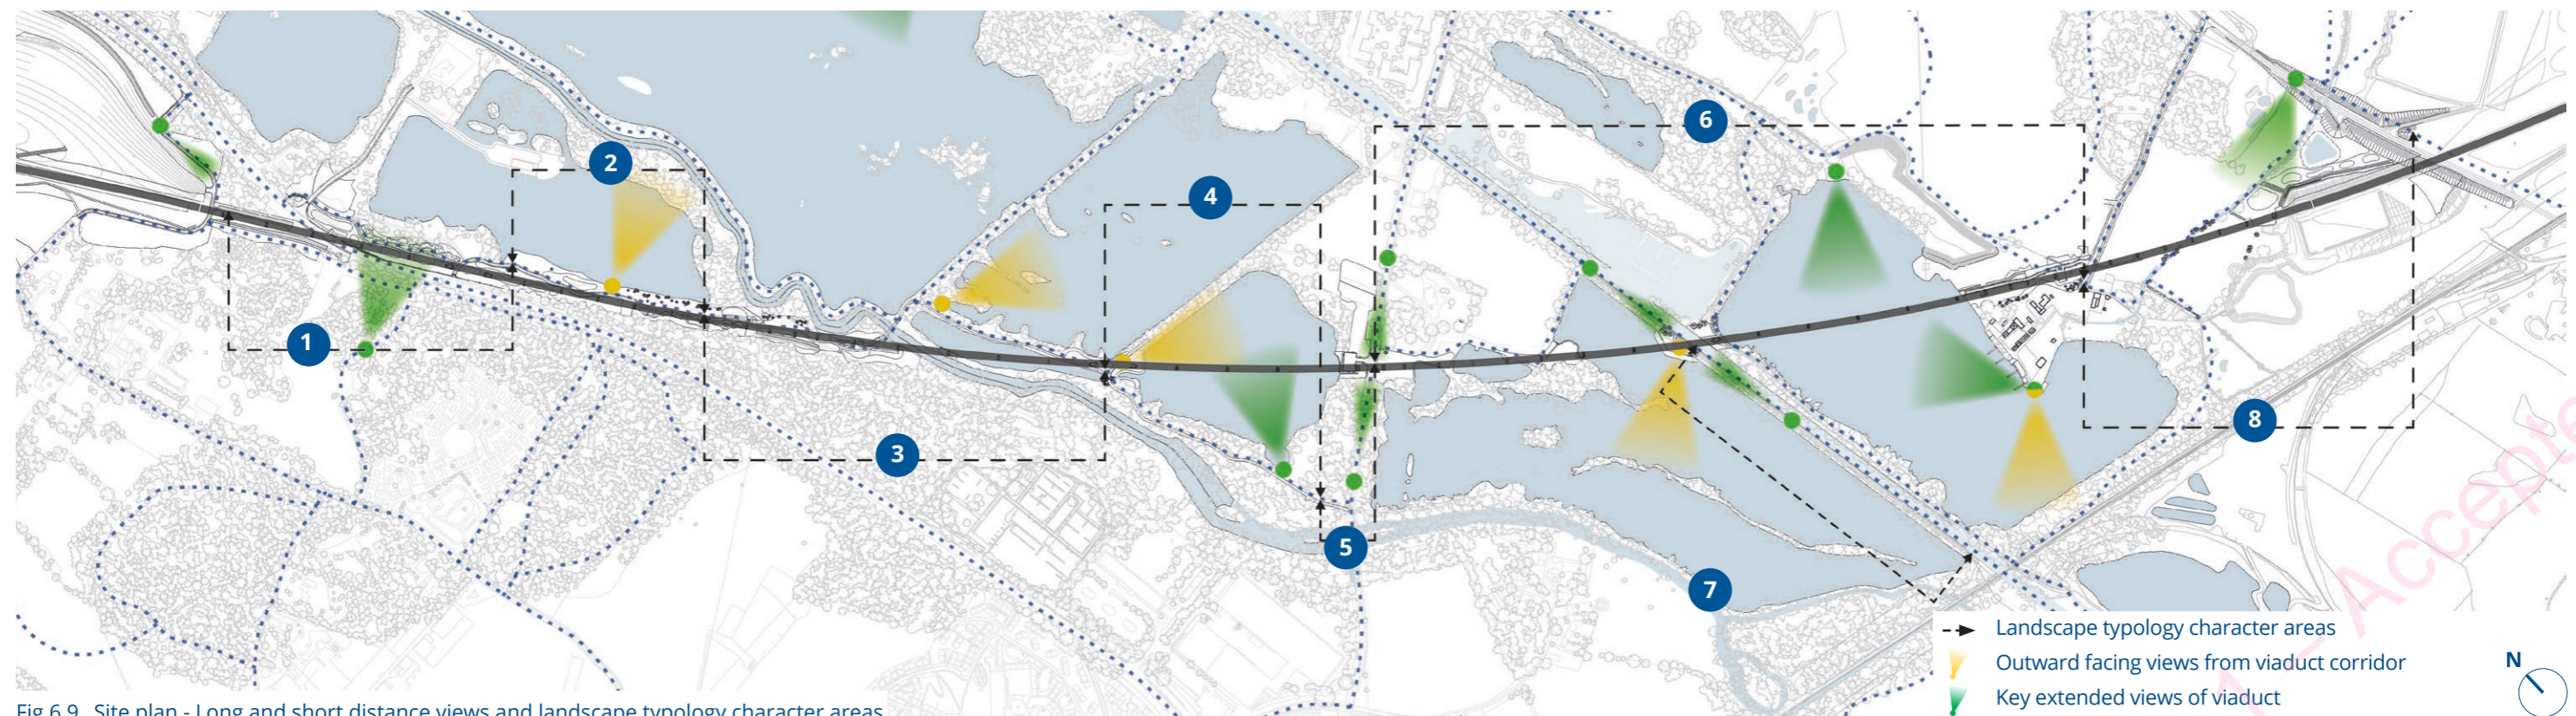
\_Site plan - Long and short distance views and landscape typology character areas
